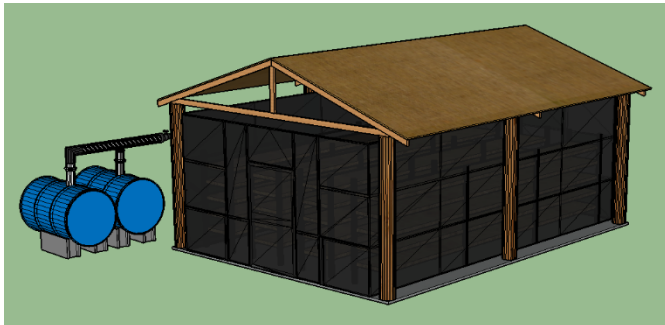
Autocad sketch depicting the common, basic design of mushroom houses in Cambodia.
